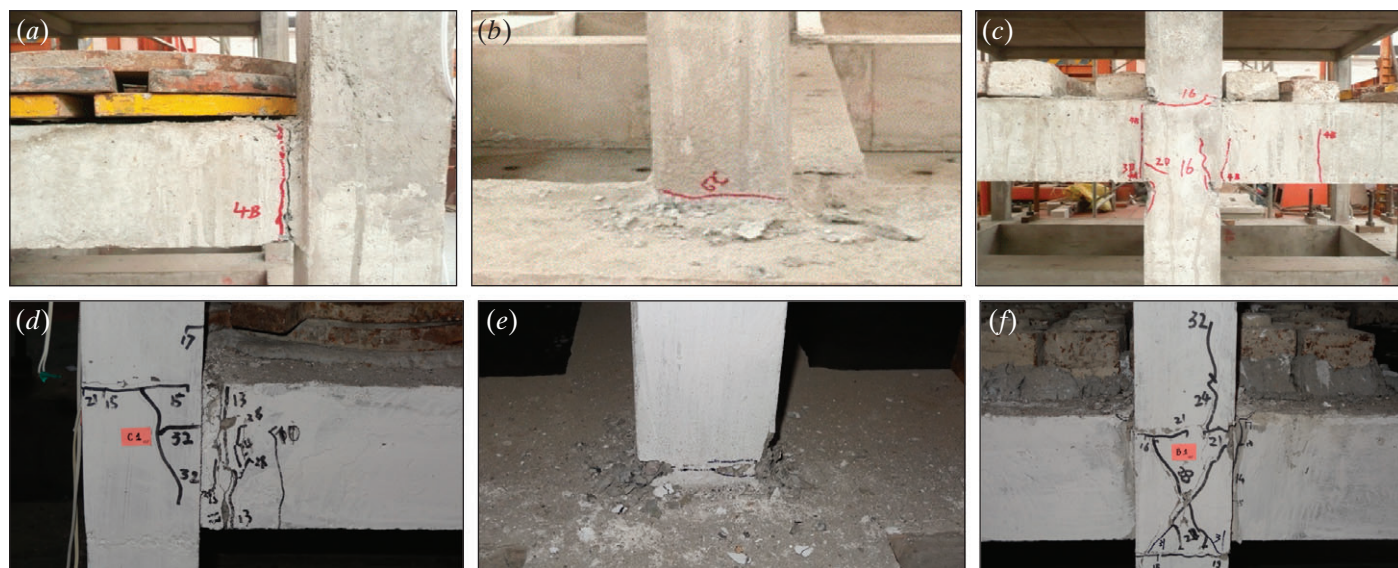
Typical crack modes of the two RAC frames. (a) Cracks on the side part of CIP frame (first floor); (b) cracks on the column base of CIP frame (base); (c) cracks on the inner joint of CIP frame (first floor); (d) cracks on the beam end of precast frame (first floor); (e) cracks on the column base of precast frame (base) and (f) cracks on the inner joint of precast frame (first floor)
